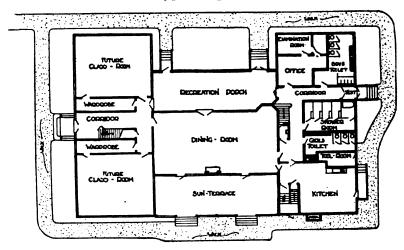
First-floor plans, Edward Mott Moore Open-air School, Rochester, N. Y.
